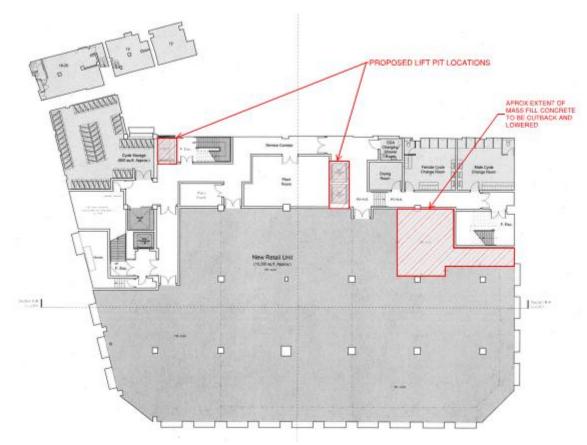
Proposed basement plan - Location of new lift pits and area of infill to be cutback and lowered.
